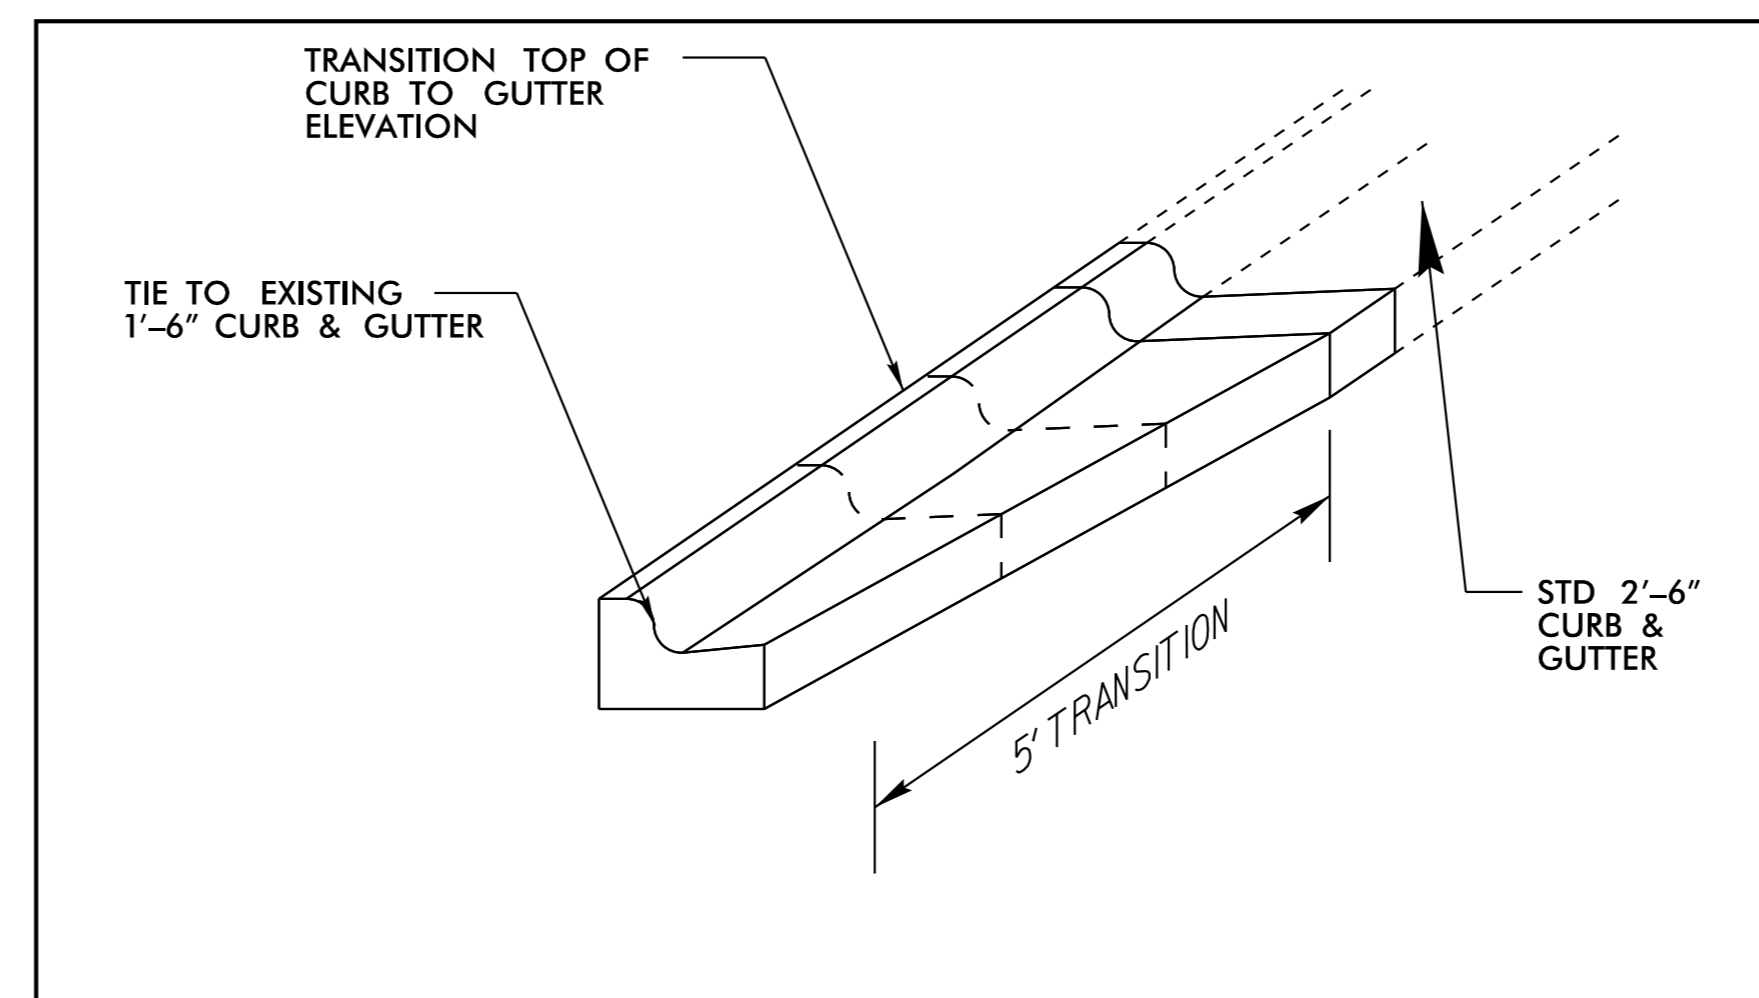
STANDARD CURB & GUTTER FLARE
